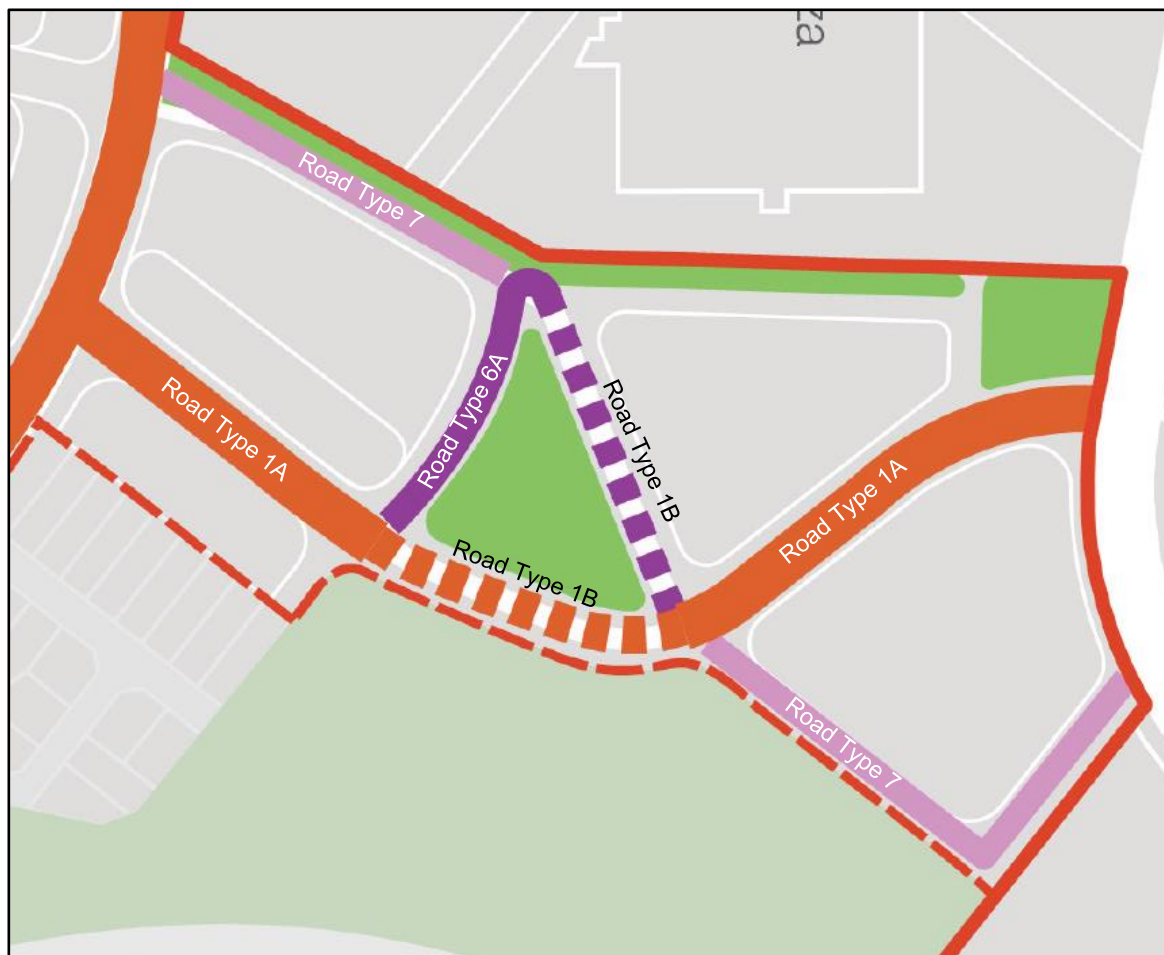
Proposed Street Network (A.15 of Modified Concept Plan 2019)
